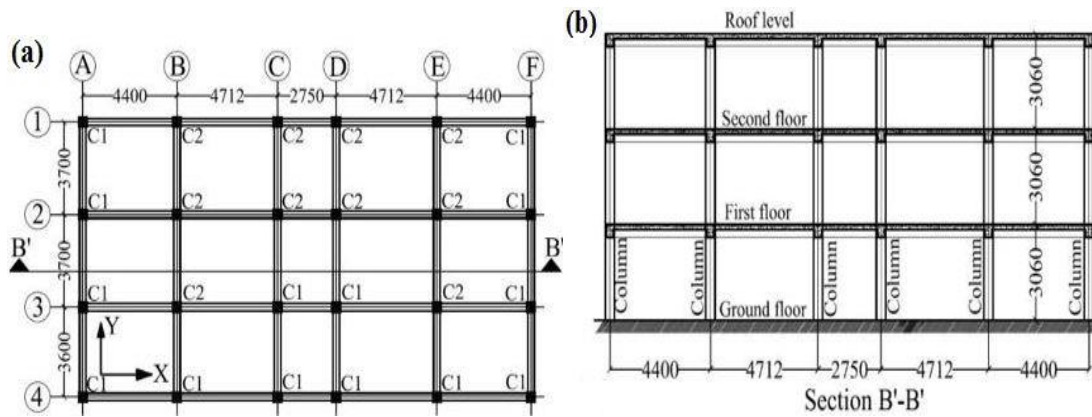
(a) Beam and column layout plan and (b) sectional elevation of 3 storey buildings.
